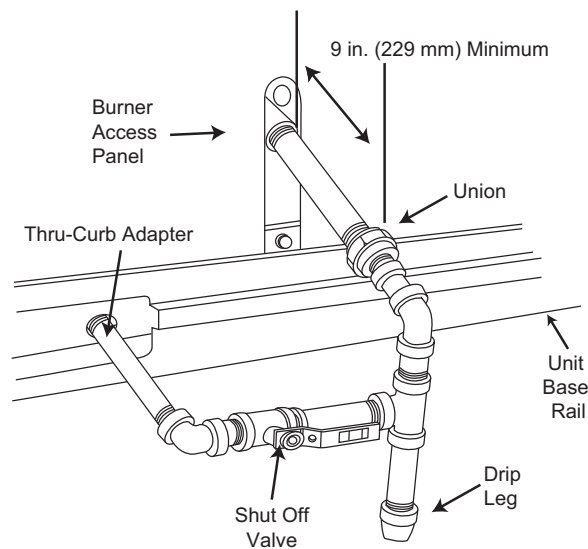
Gas Piping, Typical Curb Sidewall Piping (Example 2)
